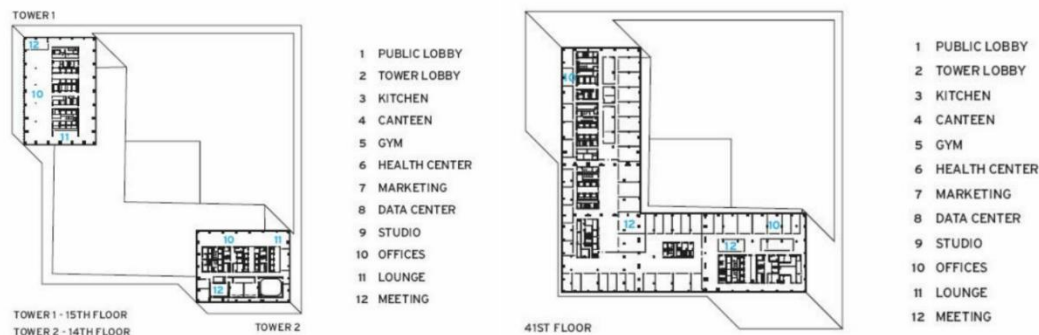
Plan of CCTV HQ, Towers connecting at 41st floor <https://www.archdaily.com/236175/cctv-headquarters-oma>
